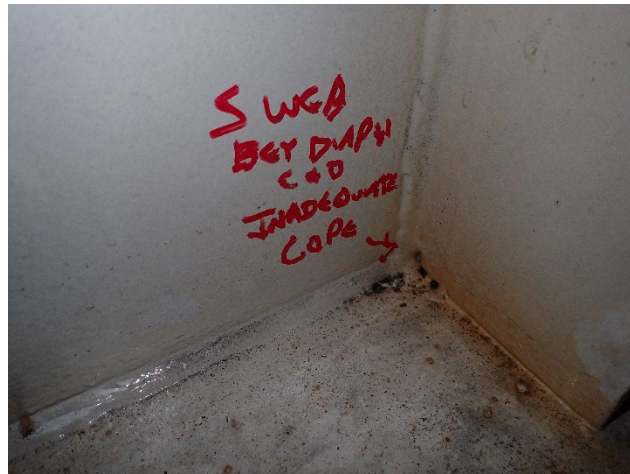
View of Top West Corner of Diaphragm D, South Cap Plate. Note Typical Triaxial Weld
